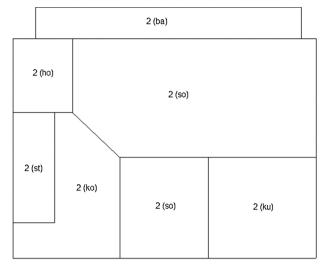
Raster floor plan from Slovenian Building Cadastre following the thinwall concept - the room annotations consist of building part number and room usage code in brackets.
